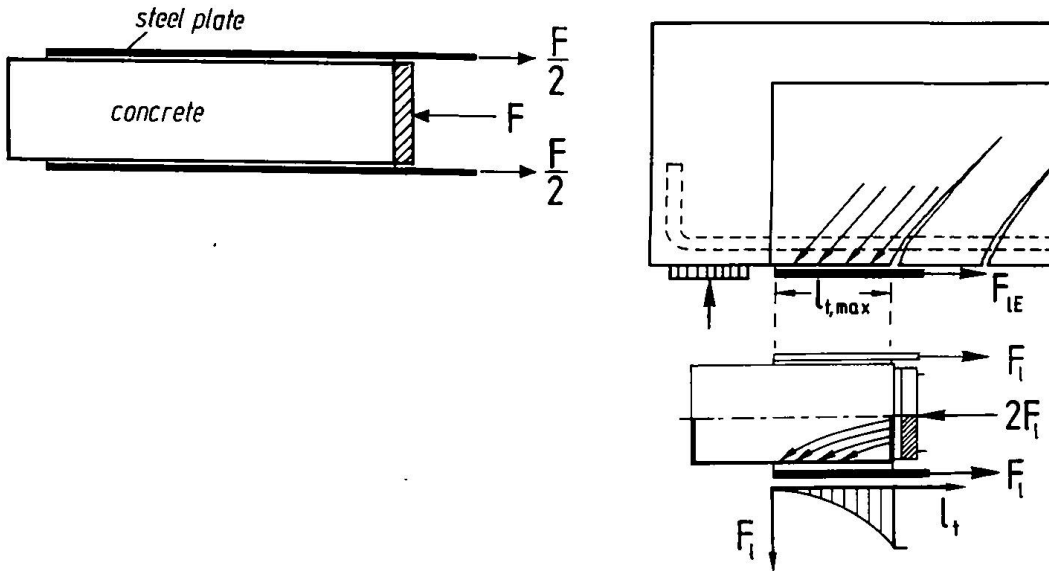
Double-lap test specimen (compression-tension), used by Bresson /5/ / (left), Plate anchorage and bond test set-up (right)
